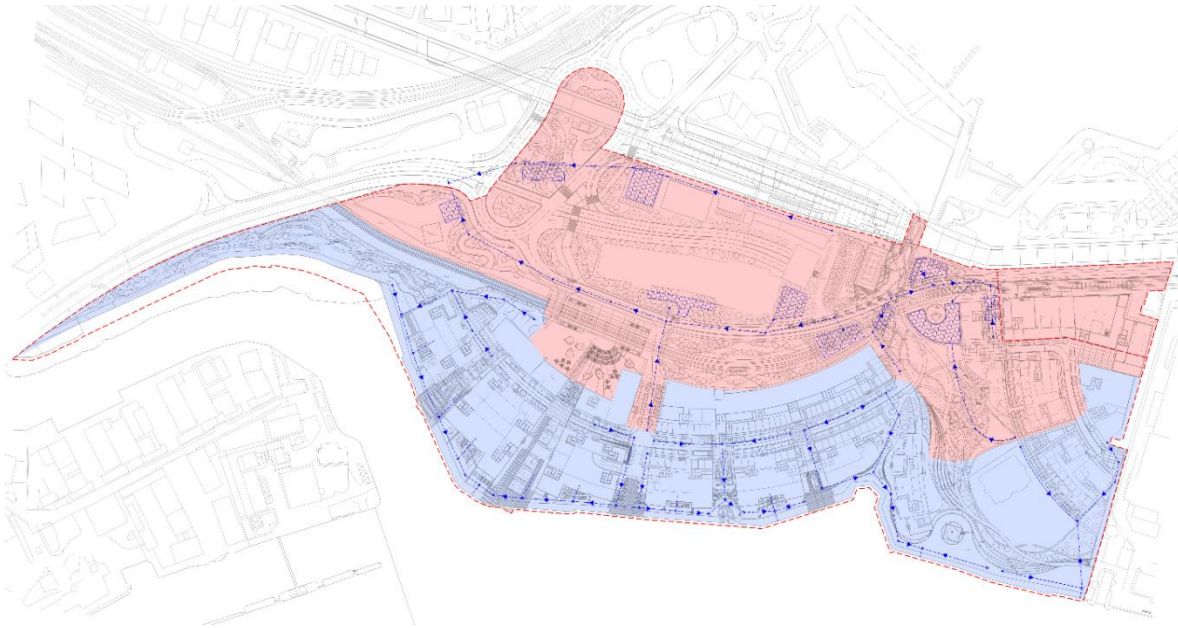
4 Plan showing the overall proposed surface water drainage strategy
